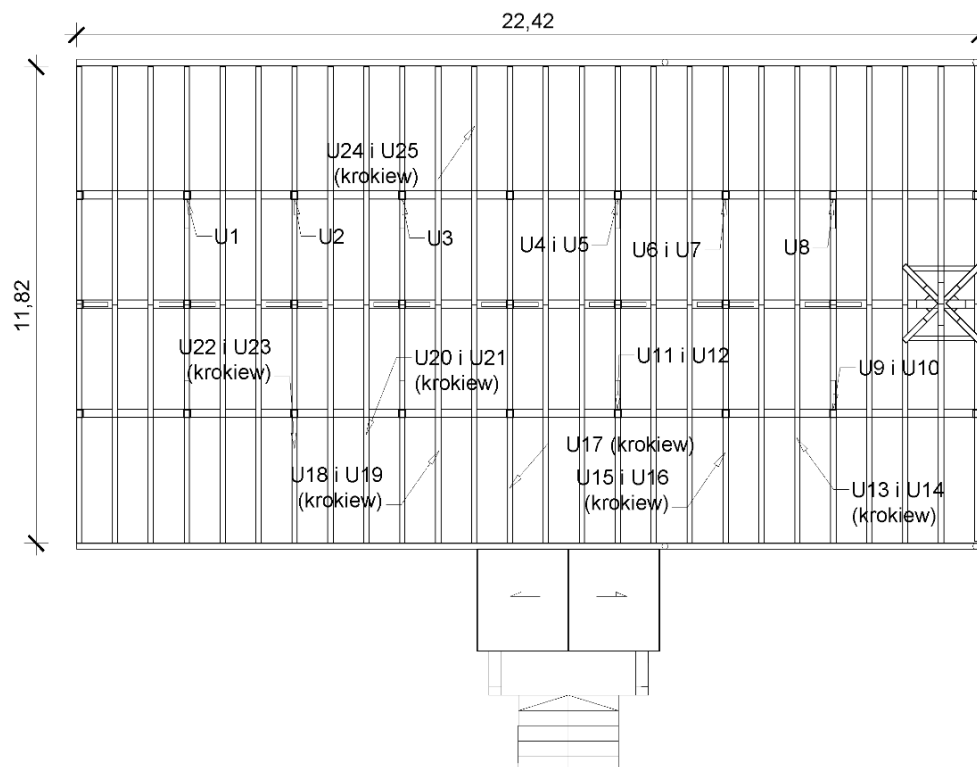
Test sites of the roof truss components using the instrument UK1401 Surfer
